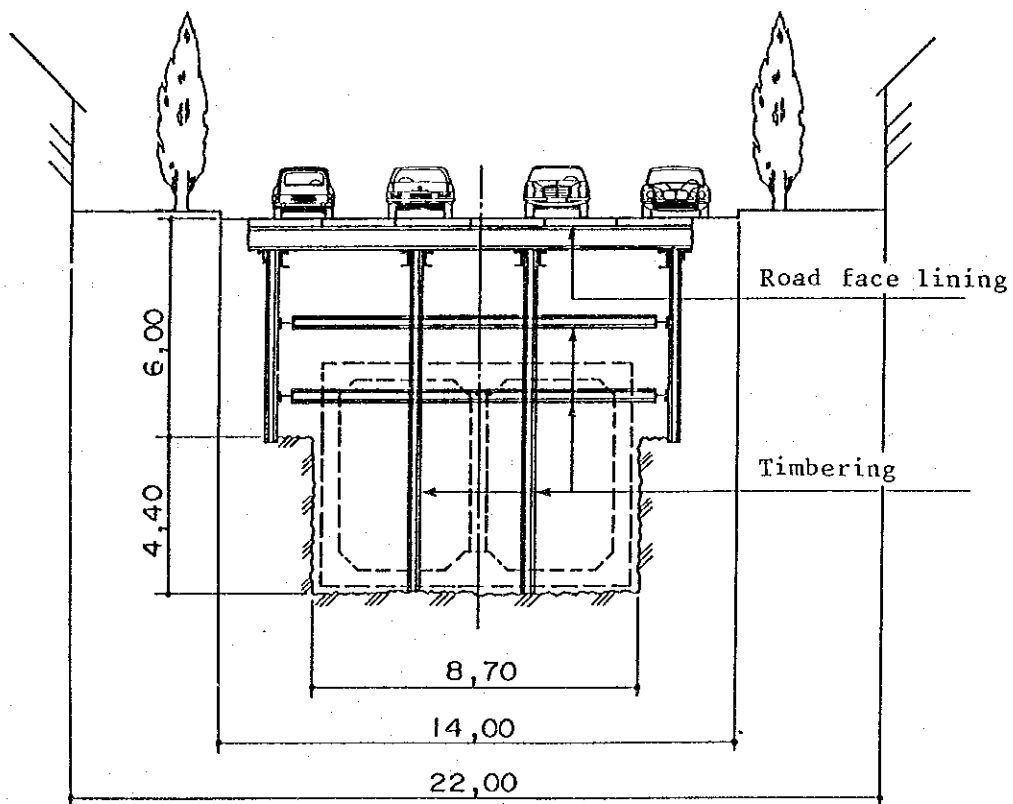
Standard Cross Sectional Diagram (Underground)
